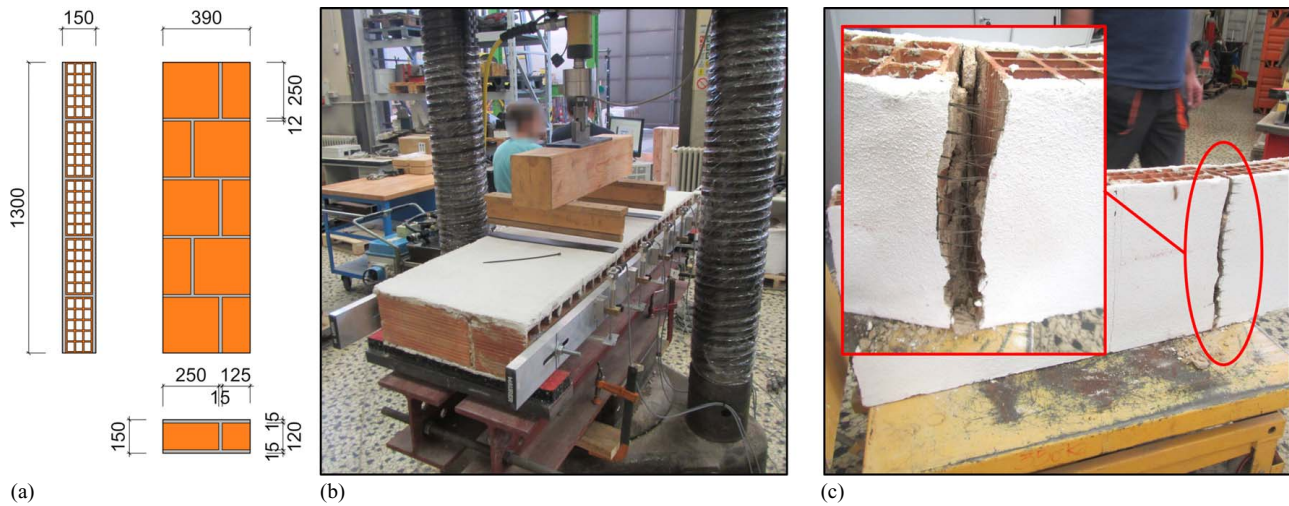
Four-point bending tests: (a) geometry with dimensions in mm; (b) test setup; and (c) failure mode.
